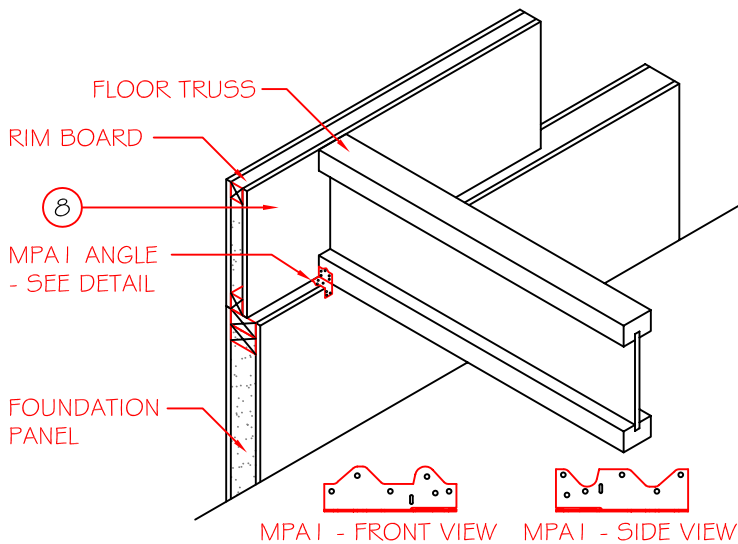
DETAIL TITLE: BELOW GRADE 8" FOUNDATION PANEL
